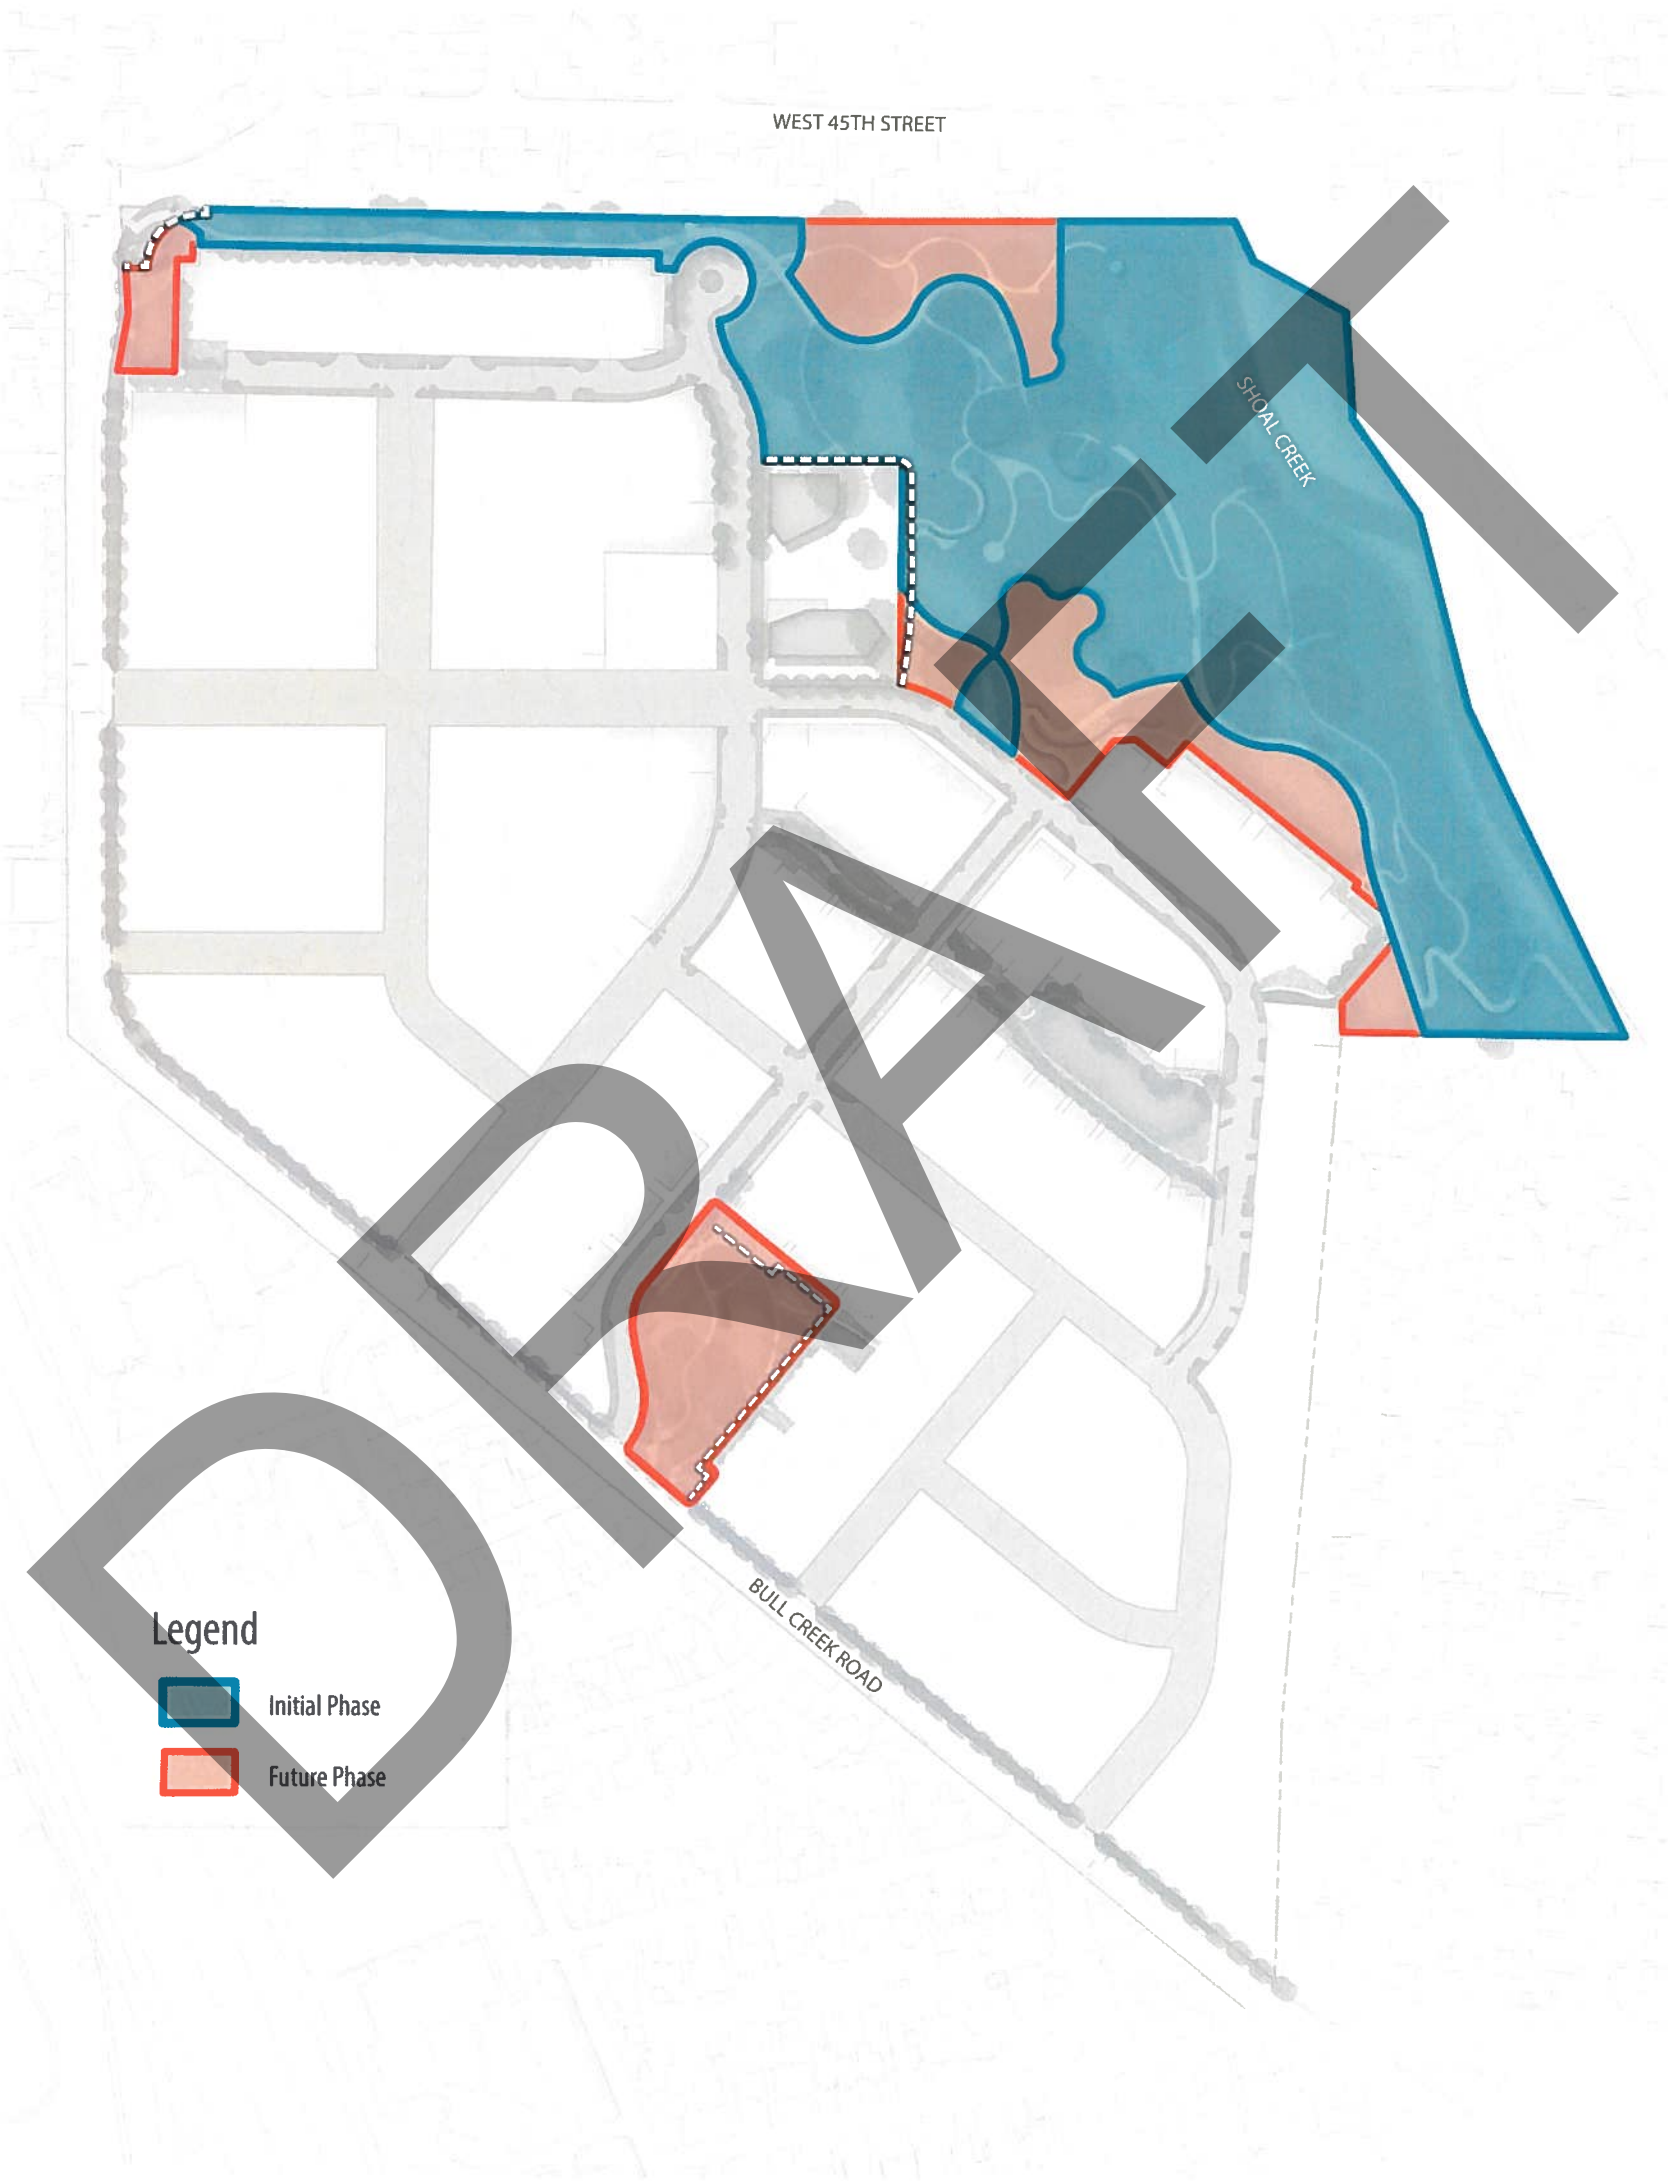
1: The Grove at Shoal Creek - Phasing Plan
